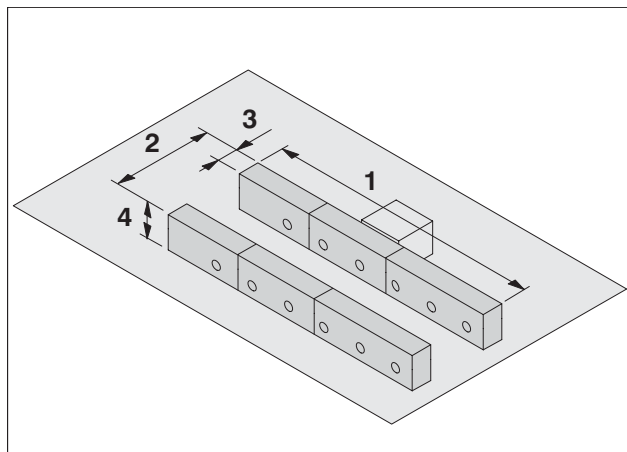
Dimensions of the foundation strips for elevated installations (diagram)
